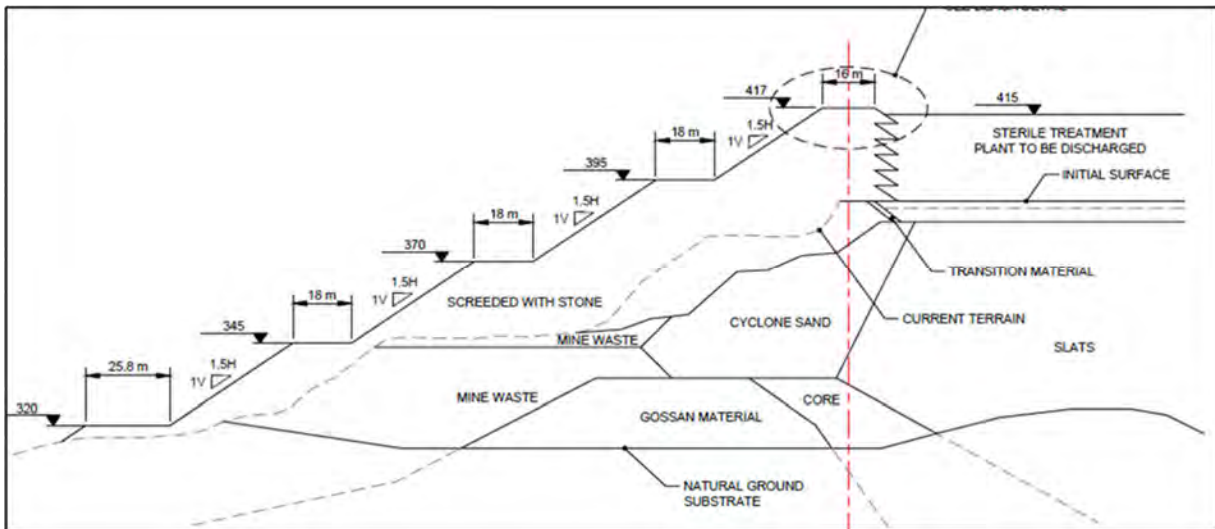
Typical Section – Cobre TSF to final planned elevation (Eptisa, 2021)
